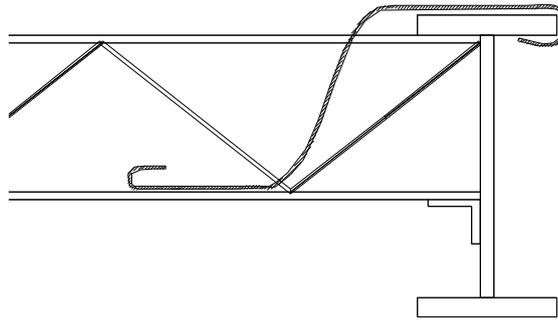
Hook steel bars in end. Lateral beam support is designed by rigid joint.
